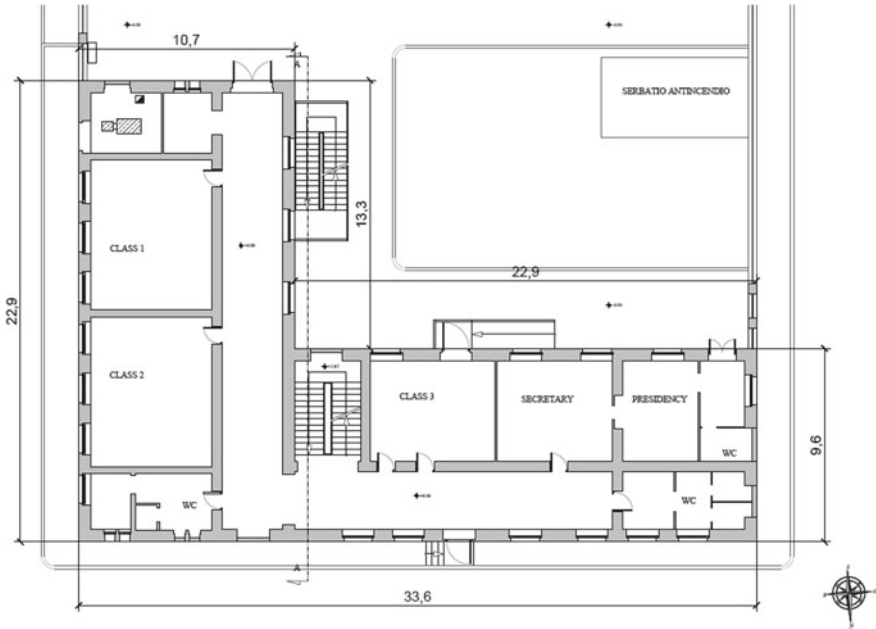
First floor plan of the ‘I.S.I.S.S. Leccisotti’ high school
